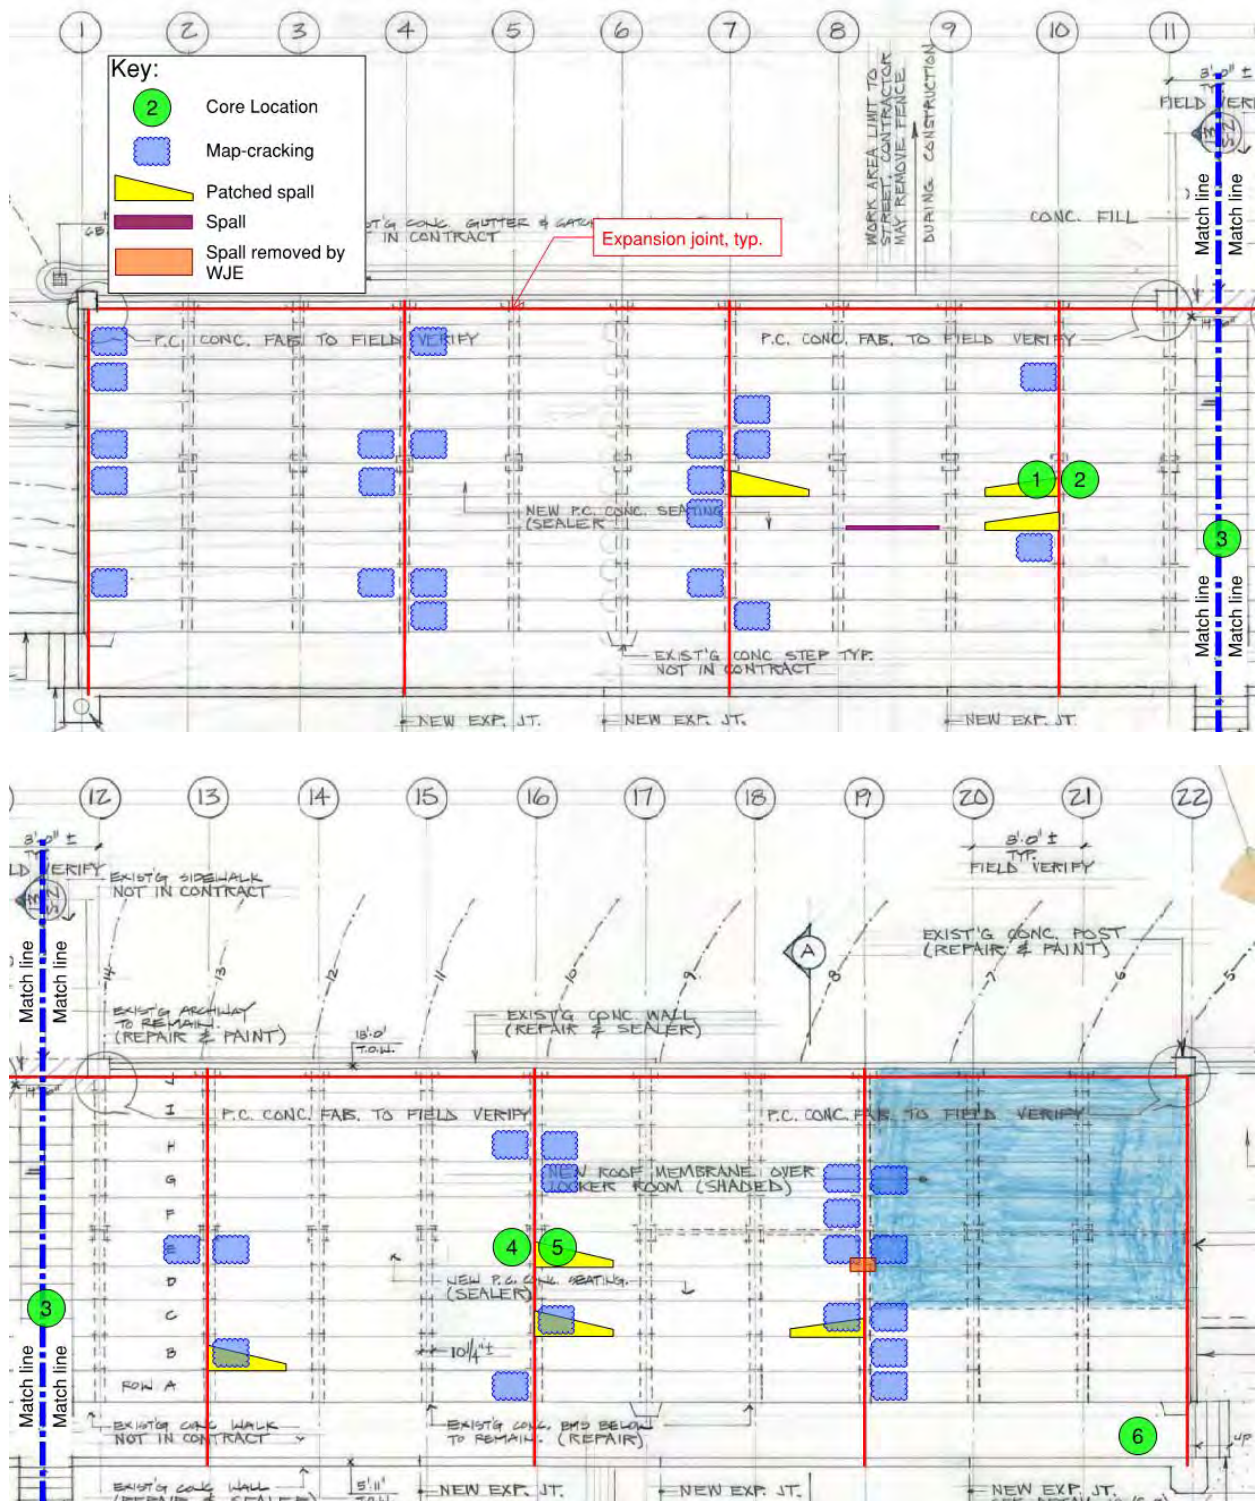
Plan view of precast concrete bleachers with locations of concrete cores, map-cracking, and spalls indicated.
